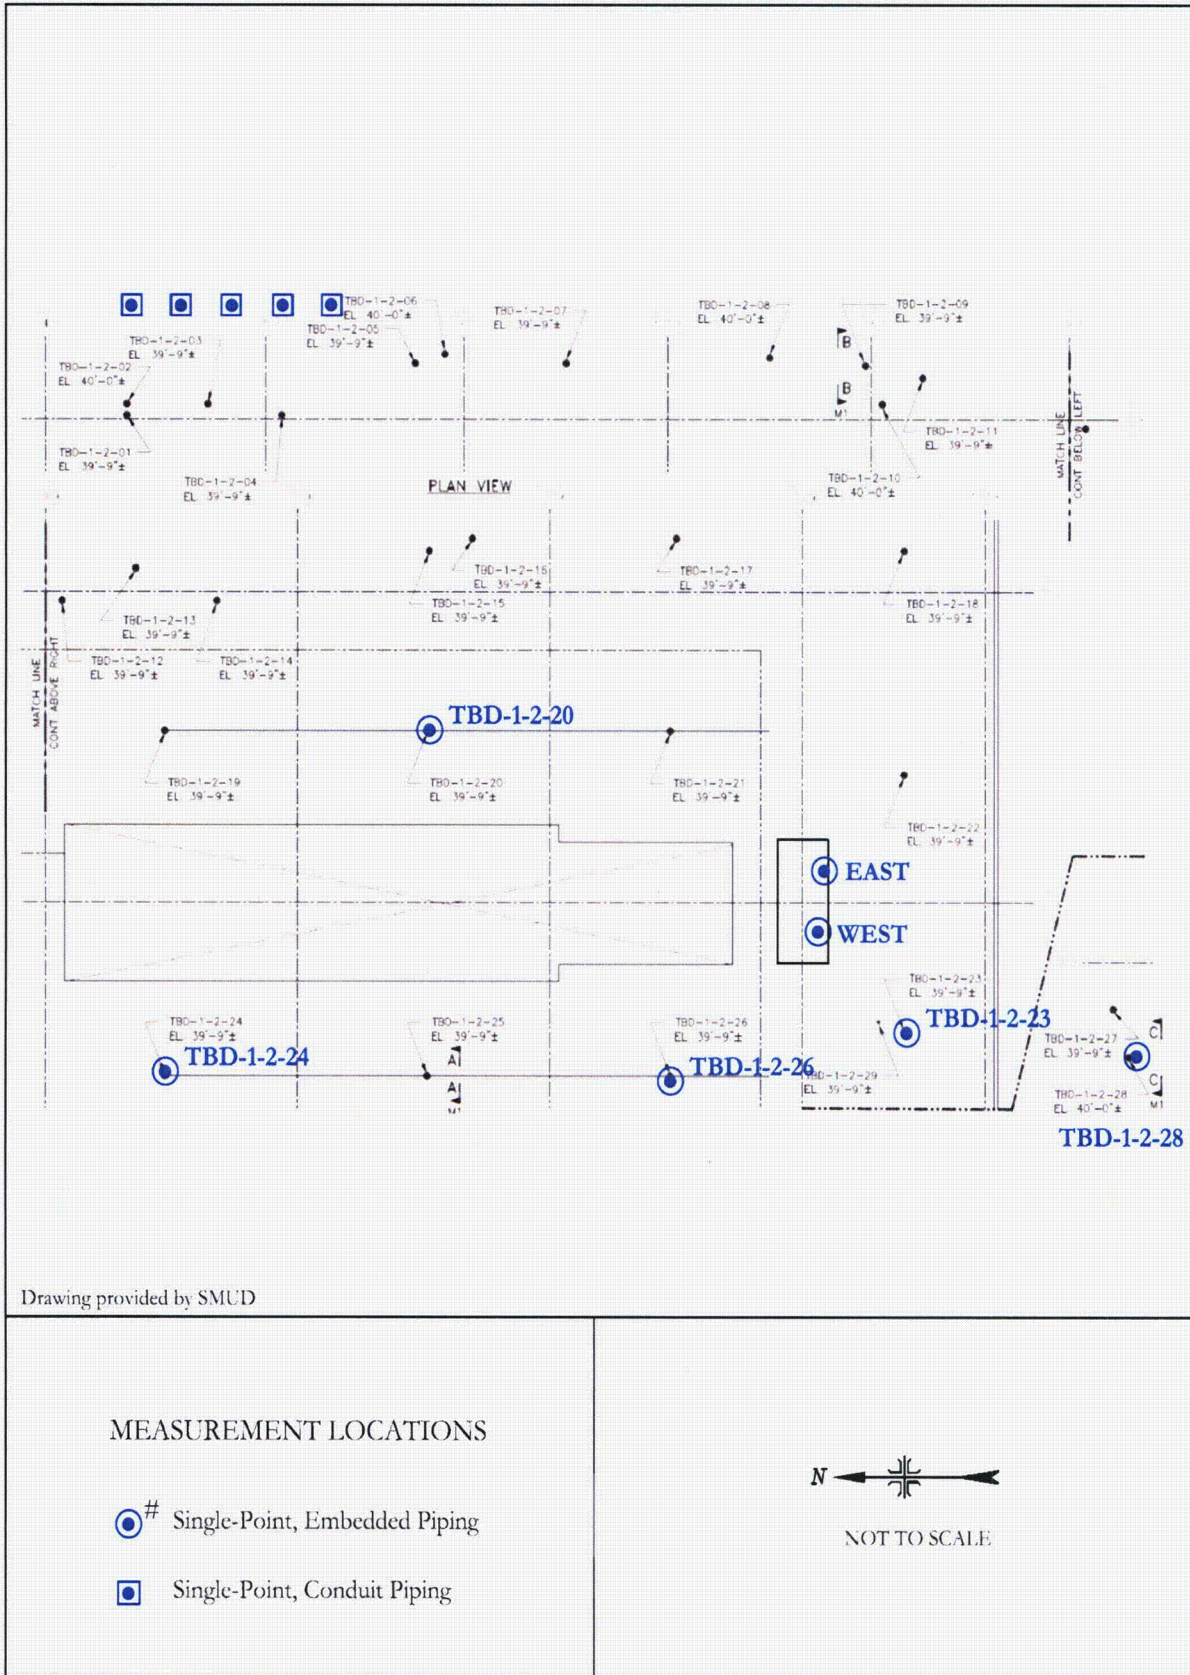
Turbine Building; 40 Foot Elevation - Embedded Piping Measurement Locations
